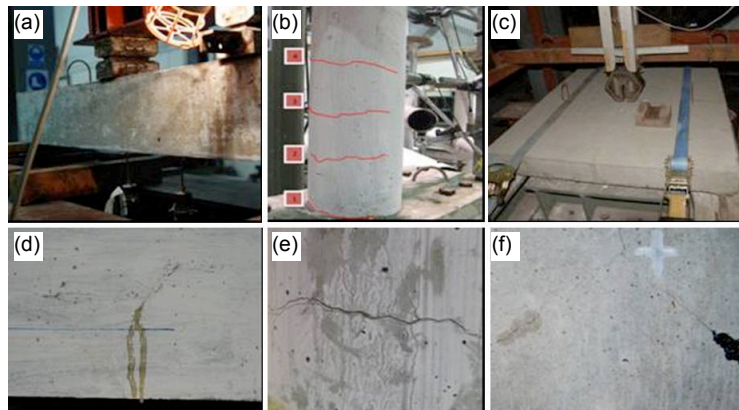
Testing of self-healing concept in concrete elements. (a) beam; (b) column; (c) slab. Self-healed cracks in (d) beams; (e) columns; (f) slabs.
